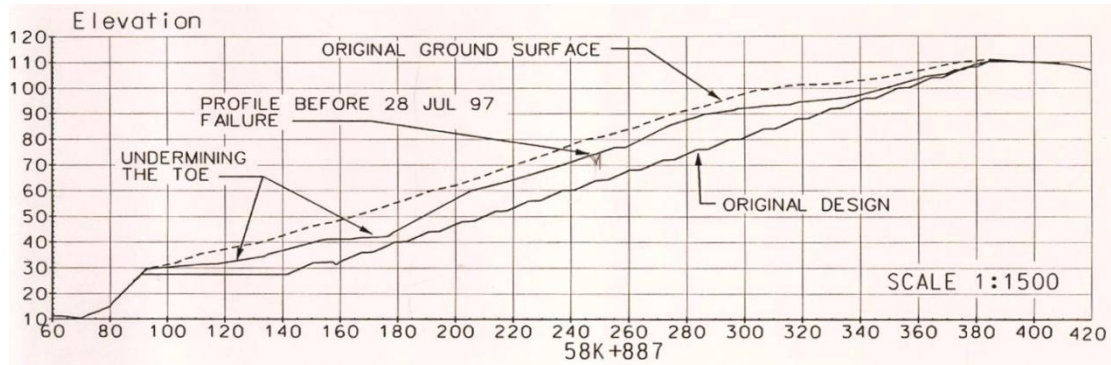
Cross Section of Excavation Prior to Failure
